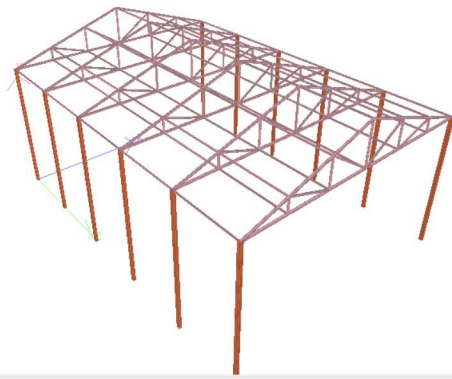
Rendering view of Steel Roof Truss using Tube section
